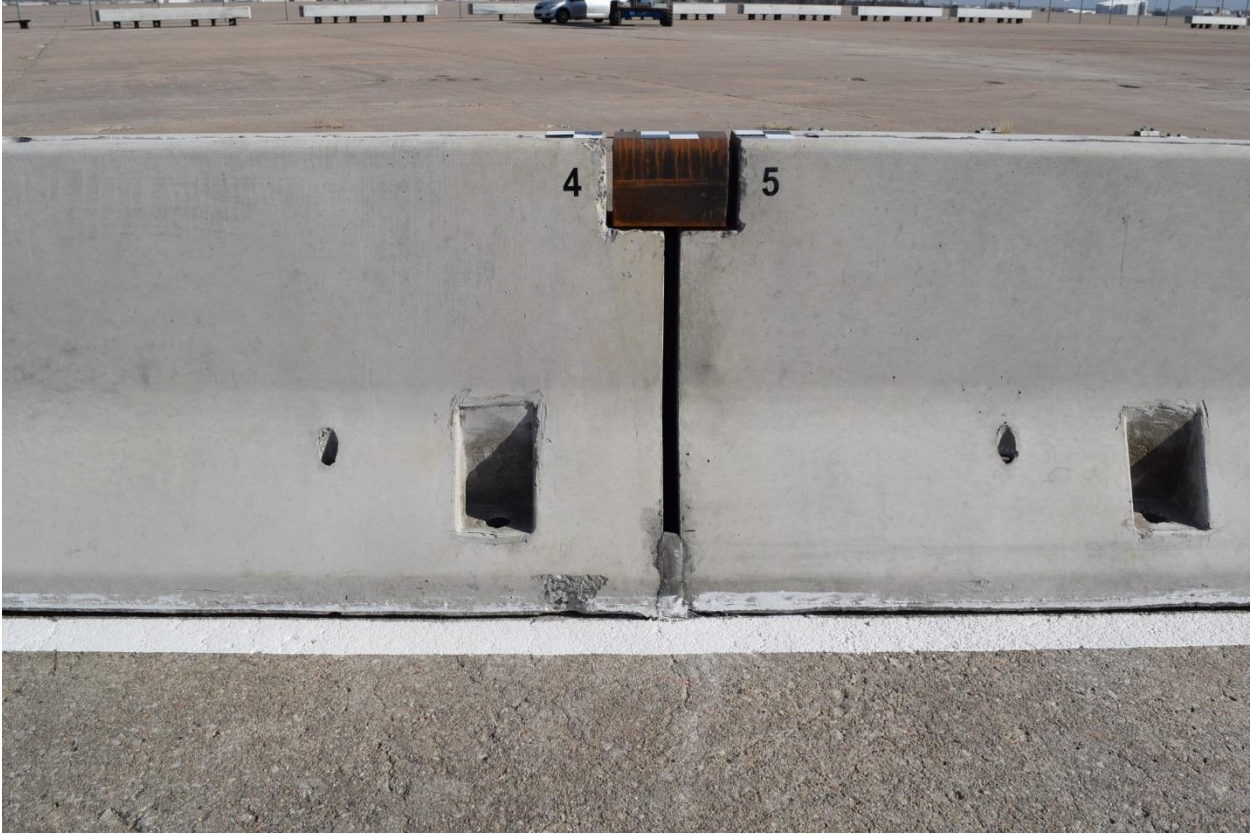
PCB Pin Anchor Recesses, Test No. NJPCB-1
